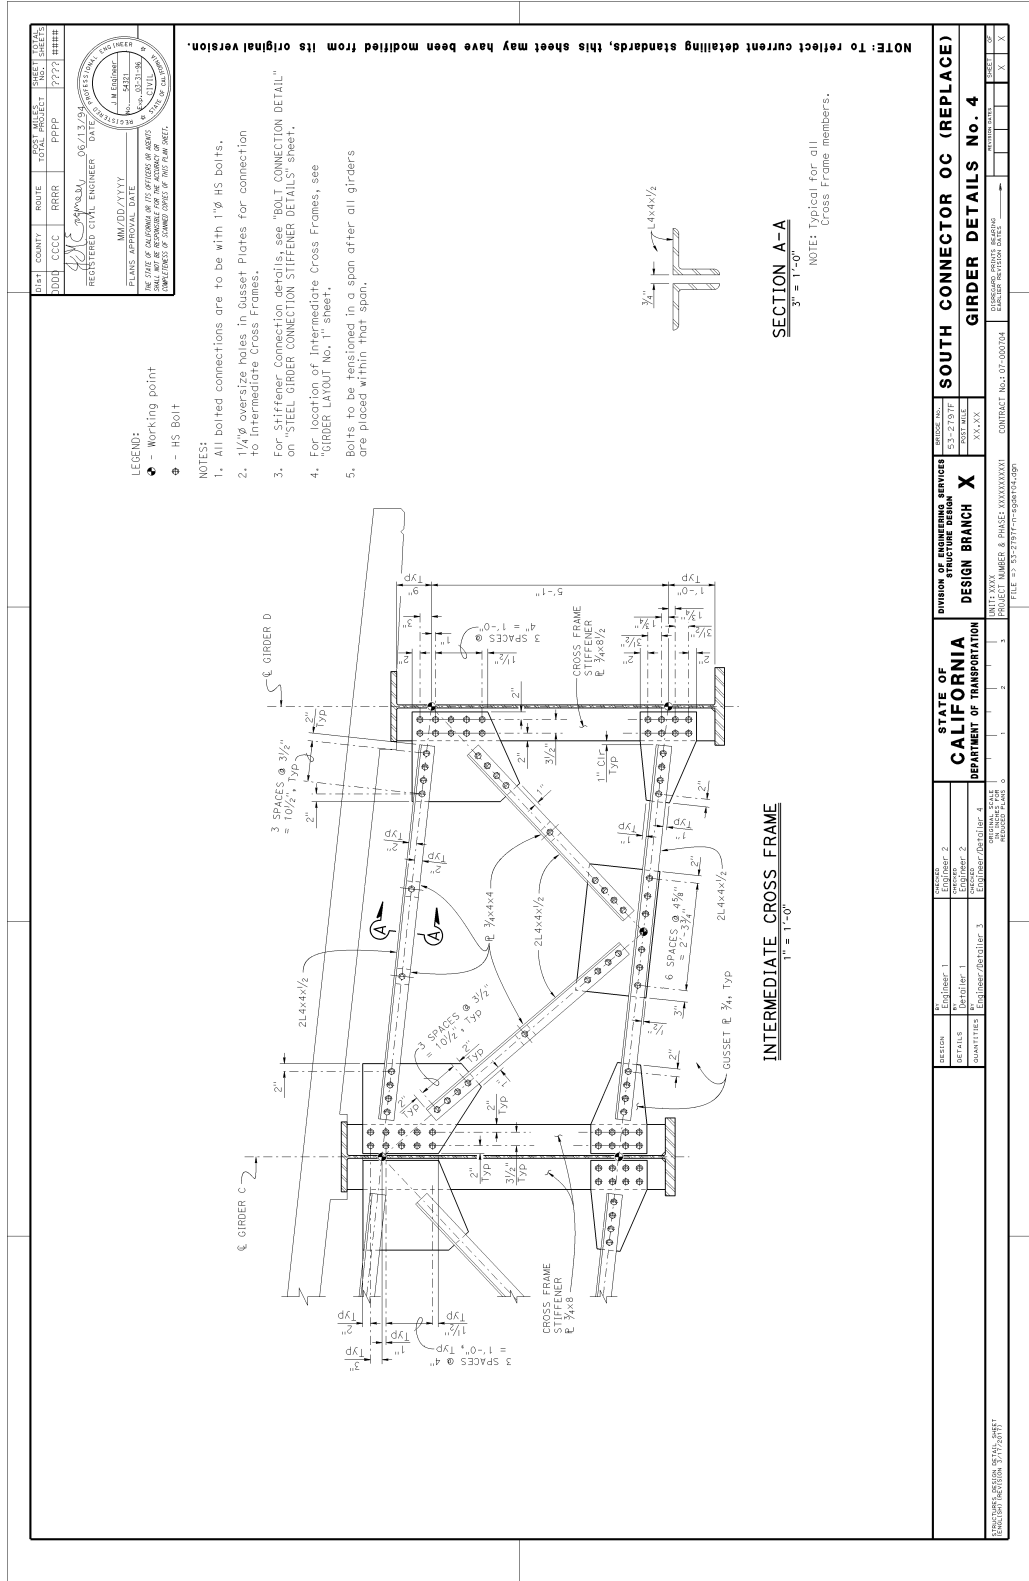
A.A.10 Steel Girder Bridge Detailing Example 10
